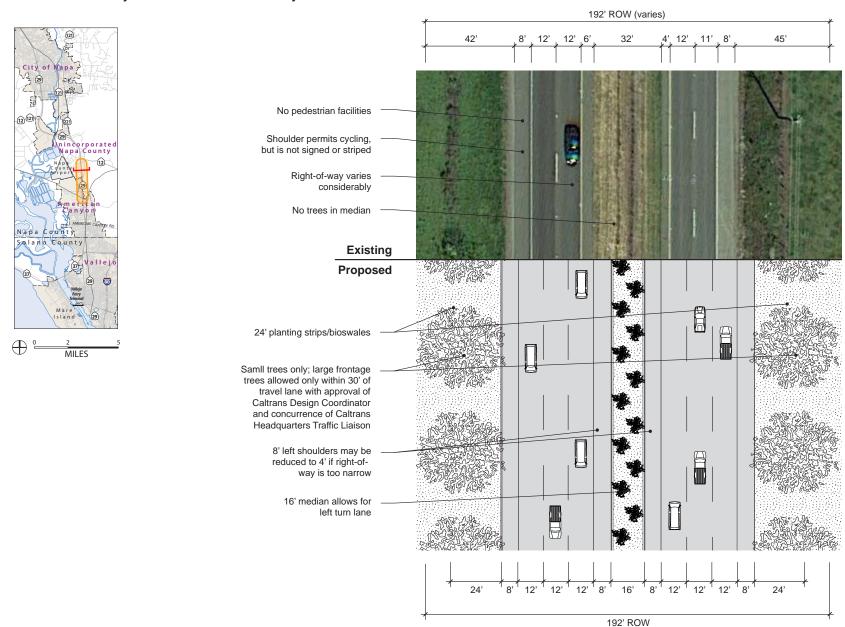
Proposed Segment - Segment 4 Rural Highway Concept (South Kelly Road to Jameson Canyon Road)
